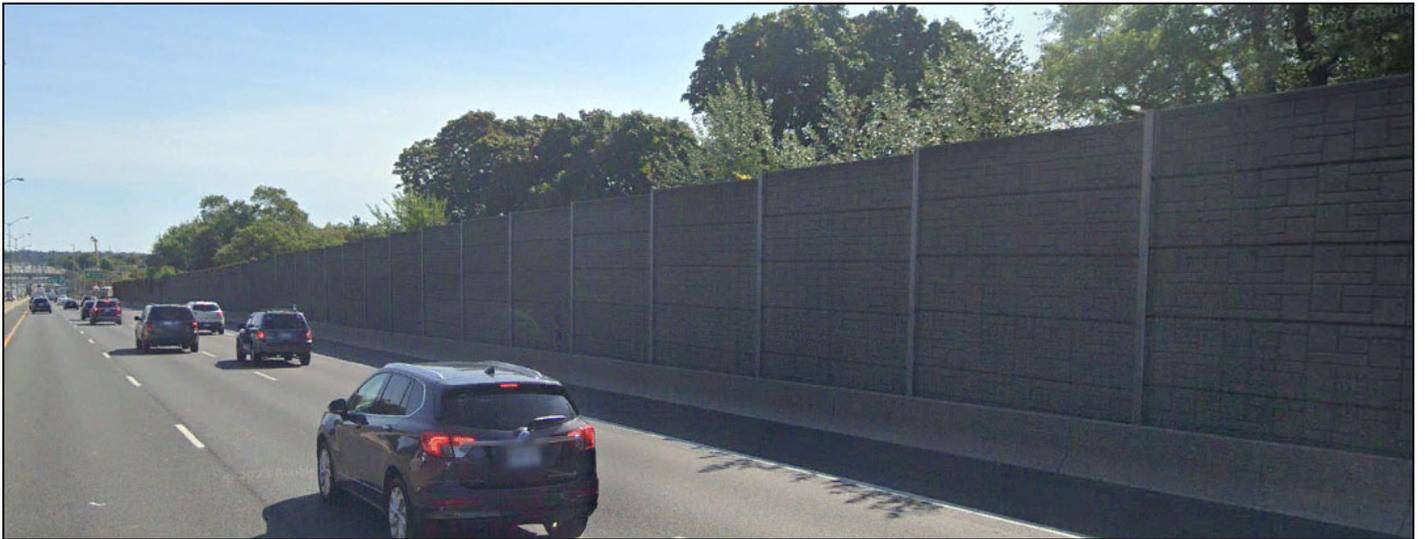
South Side of Highway 401 and Cubert St. (looking east)
